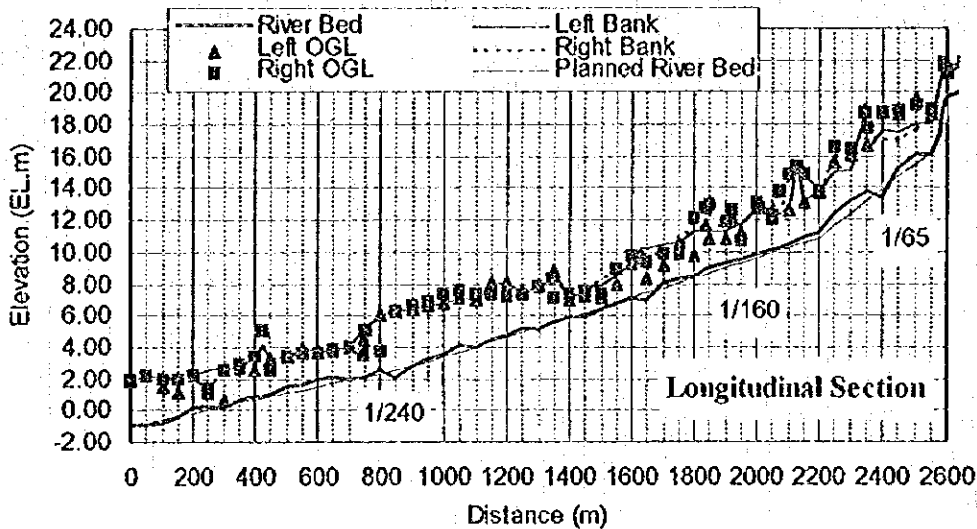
Longitudinal Section of Batu Gajah River
